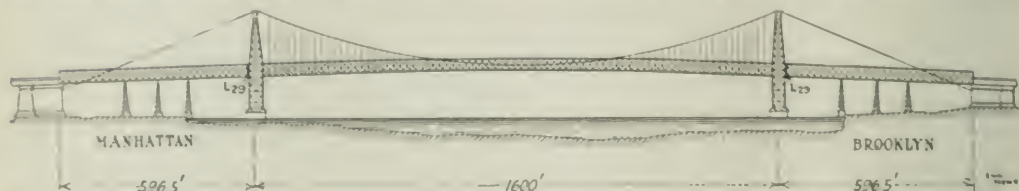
THE WILLIAMSBURG BRIDGE AS STRENGTHENED BY ADDITIONAL TOWERS IN SHORE SPANS
